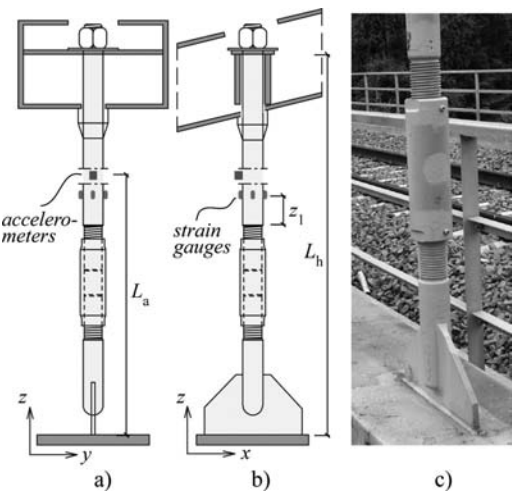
Detail of the hangers, a) section across the bridge, b) section along the bridge, c) detail of the turn buckle connection.
